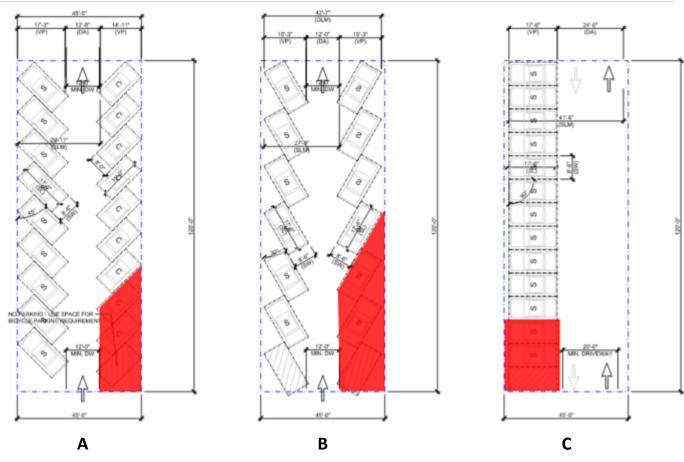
45-foot by 120-foot Site Parking Design Concepts (with Walker Parking Design Standards)
